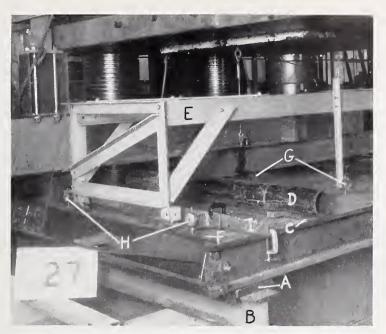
Wall specimen AP-T4 under transverse load. A, block; B, beam; C, plate; D, loading roller; E, deflection-measuring frame; F, plate; G, dial micrometer; II, dial micrometer; I, angle.
